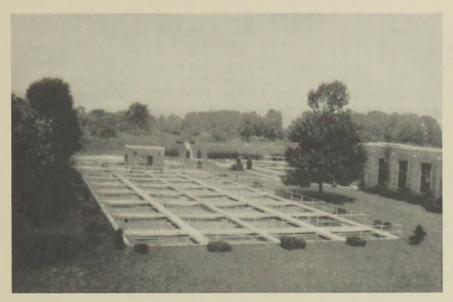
Activated sludge plant at Findlay, Ohio.
